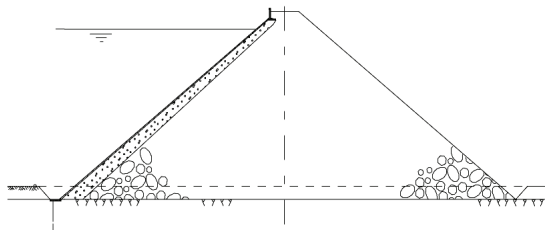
Typical cross-section of a concrete faced rockfill dam (Foz do Areia hydropower plant – Gov. Bento Munhoz da Rocha).
